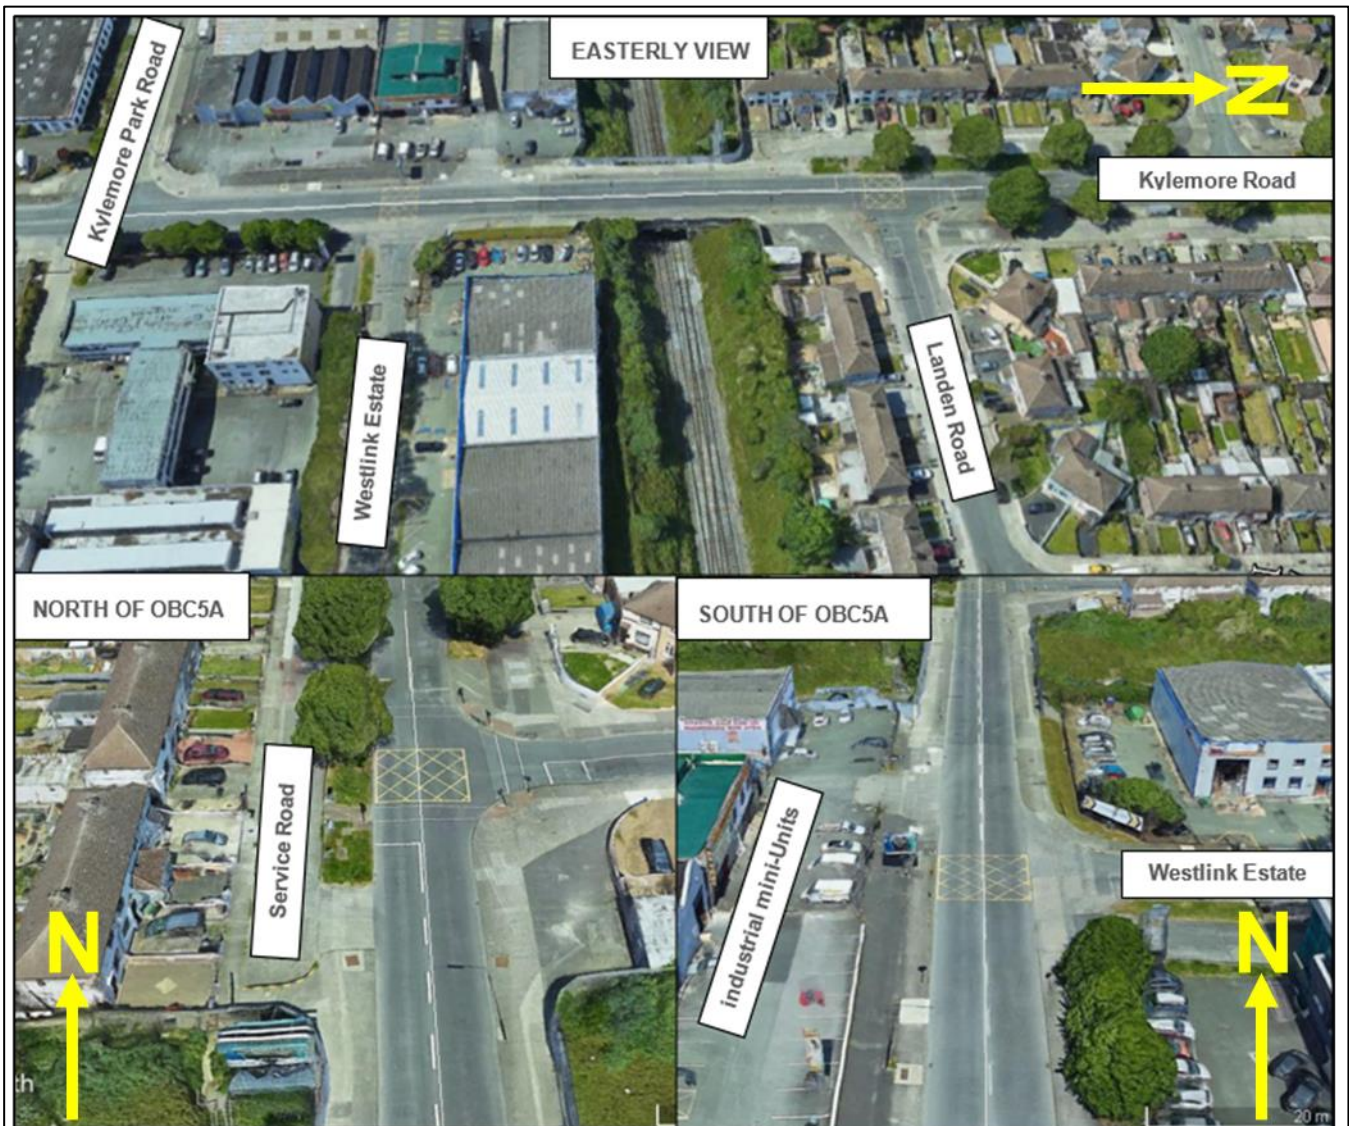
Aerial view of the roads affected by the raising of bridge levels.
